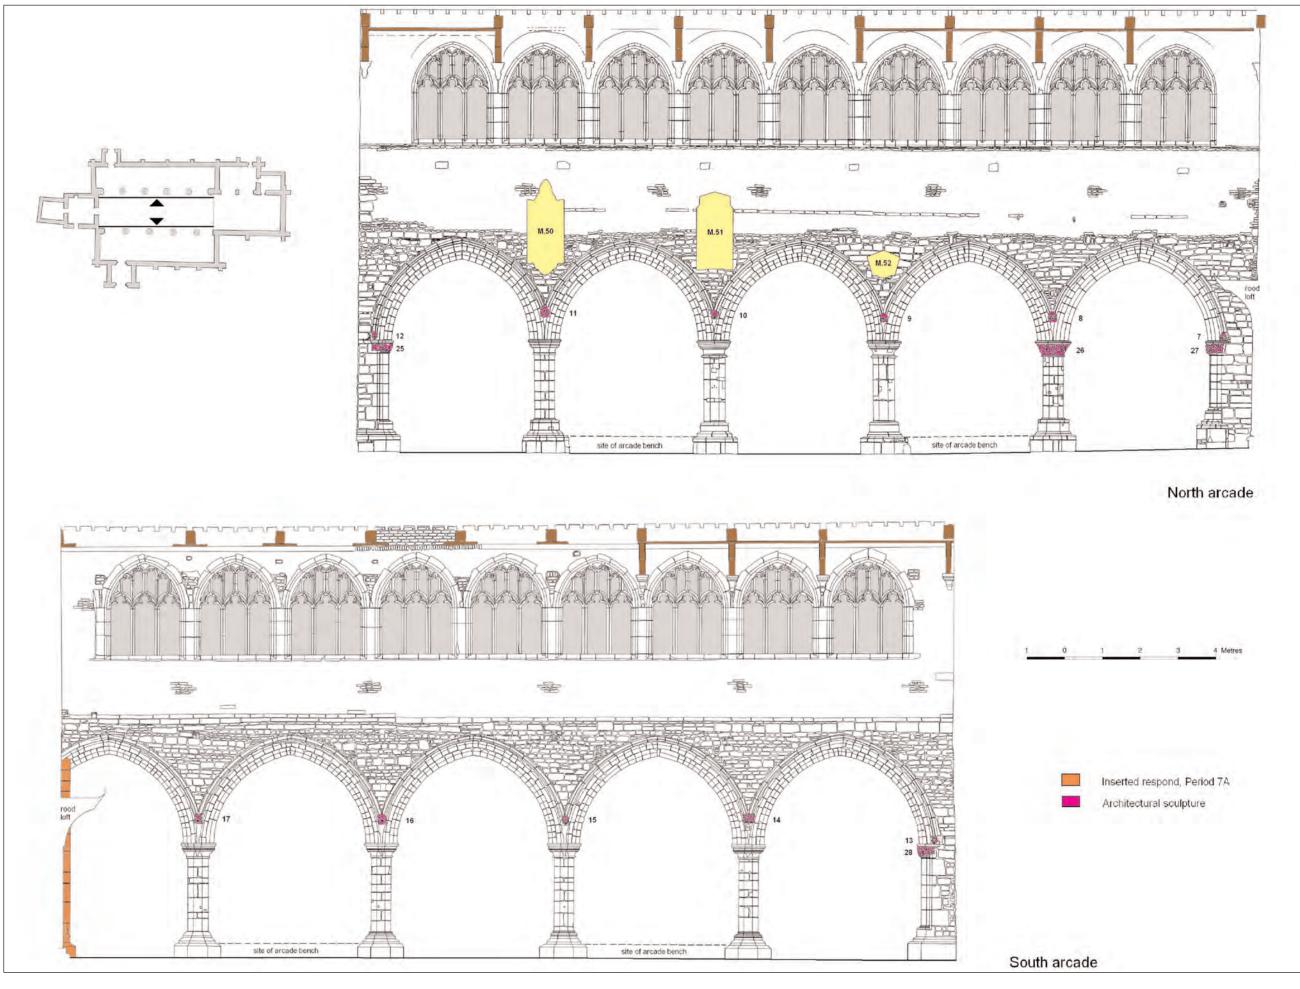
Nave arcades and clerestories. Internal elevations, 1984. The positions of wall-mounted memorials are also shown (M. 50–M. 52). Scale 1:100. Drawing: Simon Hayfield
